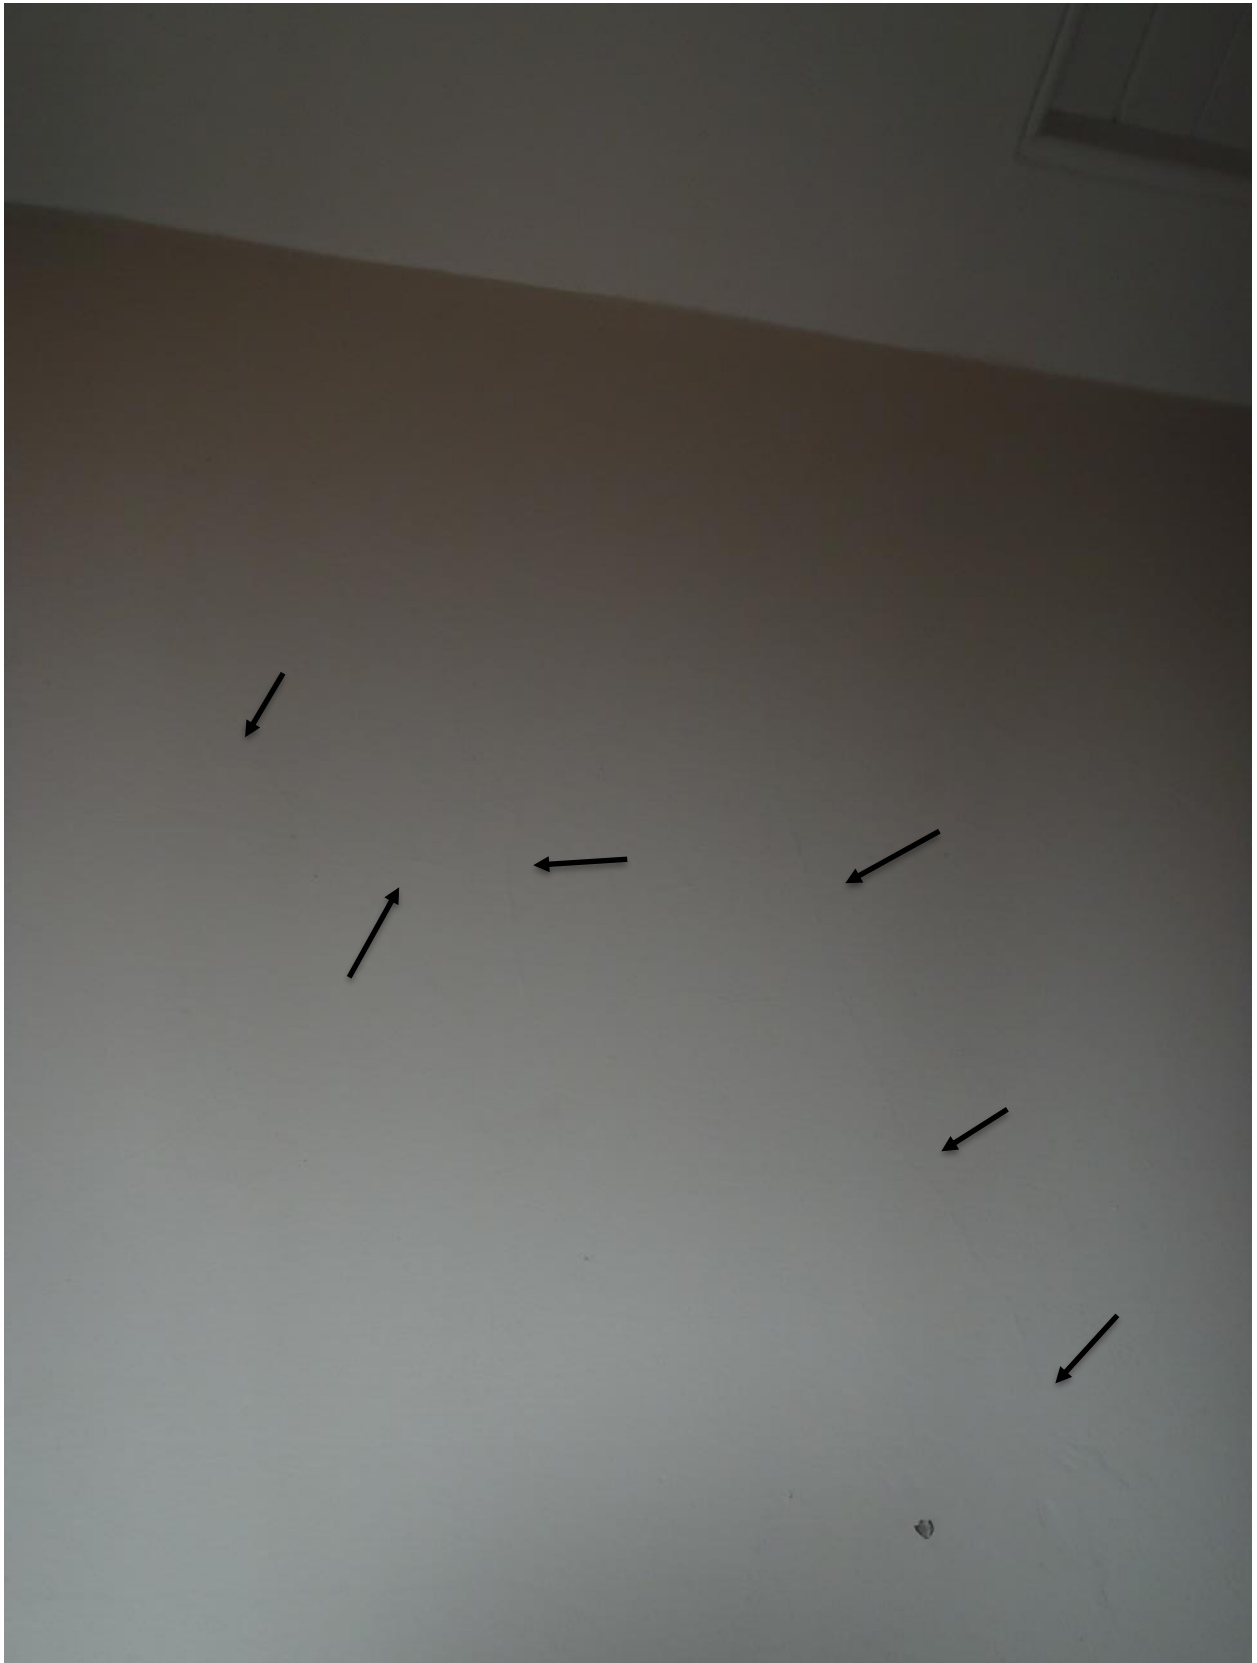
shows hairline radial cracking to the fibrous plaster ceiling on the western side of the decorative ceiling rose in the Hallway.
